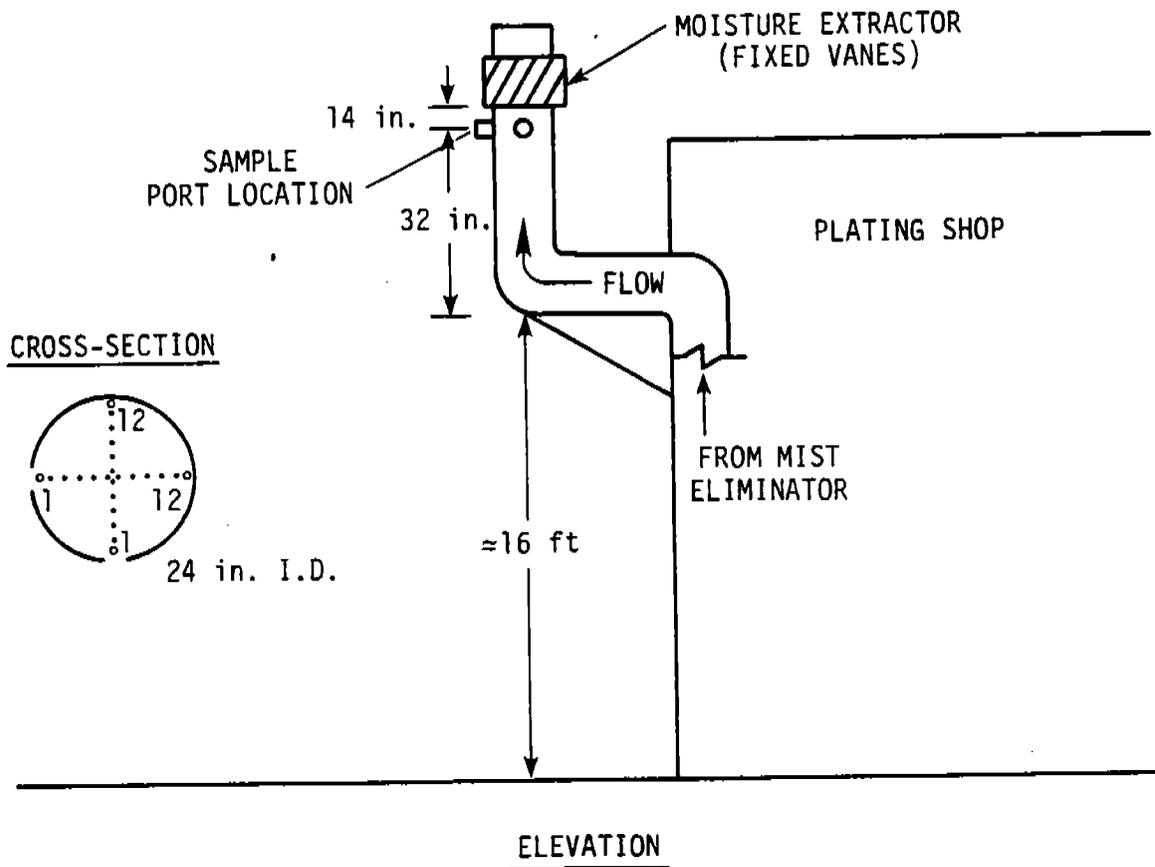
Tank No. 1 Outlet Sample Location, Able Machine Co.
